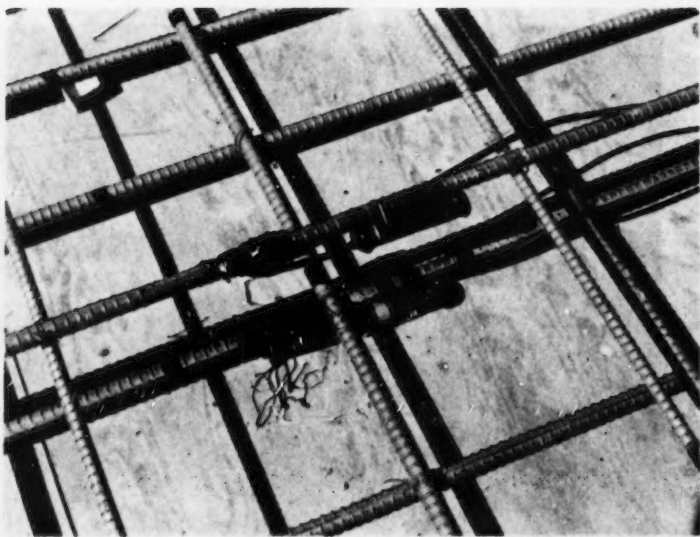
Active and Dummy SR-4 Gages Installed on Reinforcing Bars.
